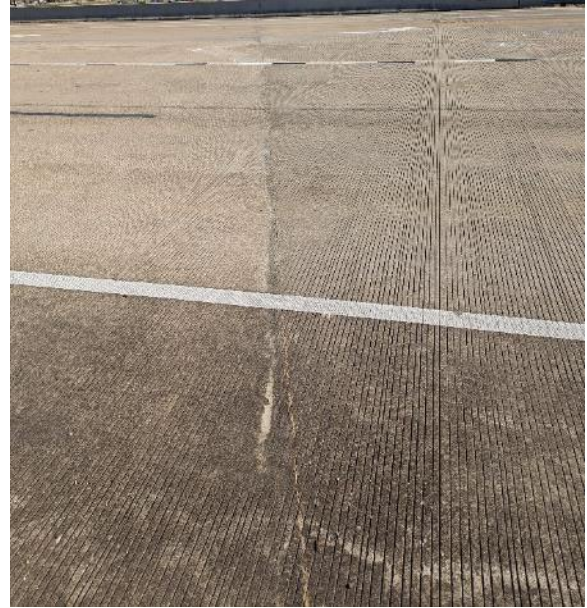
(c): Construction joint in bridge deck between Bents 1 and 2
